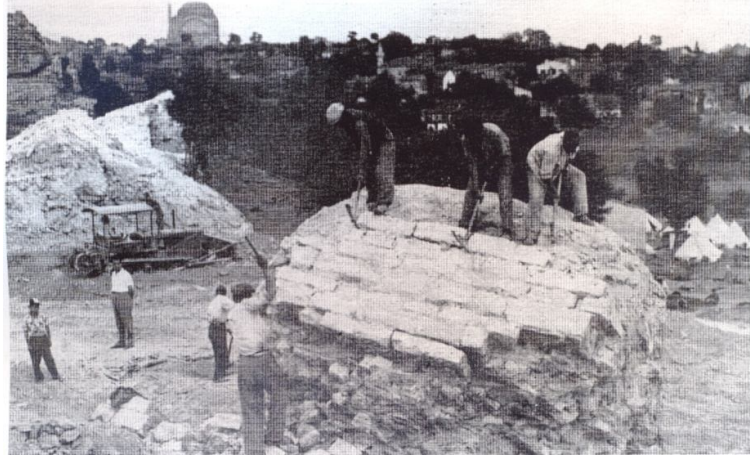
Demolition of the Land Walls in the construction of Vatan Avenue.
